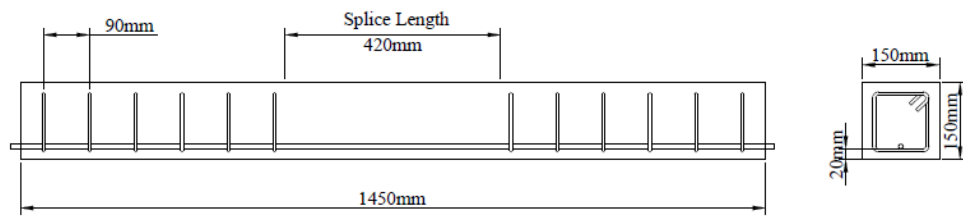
Steel or FRP Reinforced Concrete Beams – Dimensions and Reinforcement Detailing
